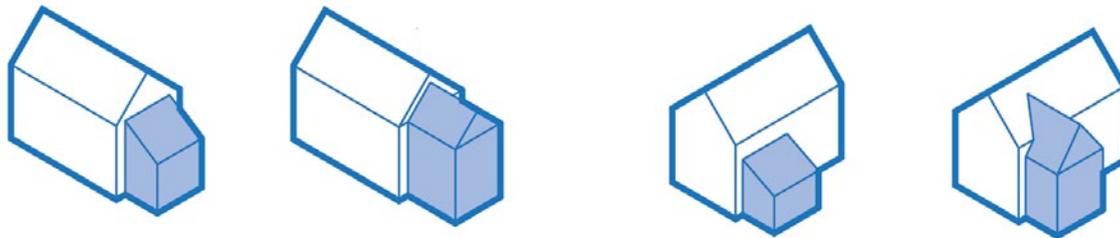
Good examples for side extensions, respecting existing building scale, massing and building line.
